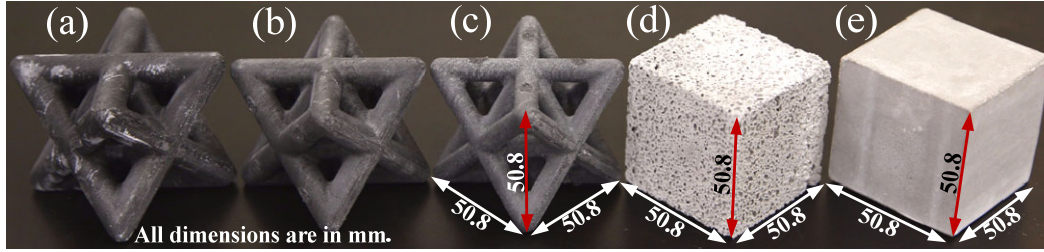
50.8-mm side-length UHP-FRC OTEC unit cell material specimens with (a) 11, (b) 10, and (c) 8 mm-diameter elements and (d) 50.8-mm foam G-UHPC cube and (e) 50.8-mm solid G-UHP-FRC cube material specimens before testing under uniaxial compression.
